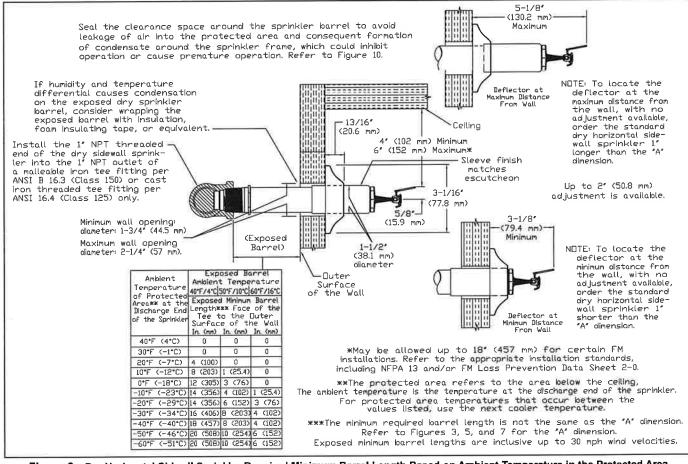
Dry Horizontal Sidwall Sprinkler Required Minimum Barrel Length Based on Ambient Temperature in the Protected Area (Adjustable Standard Dry HSW Sprinkler is Shown)
